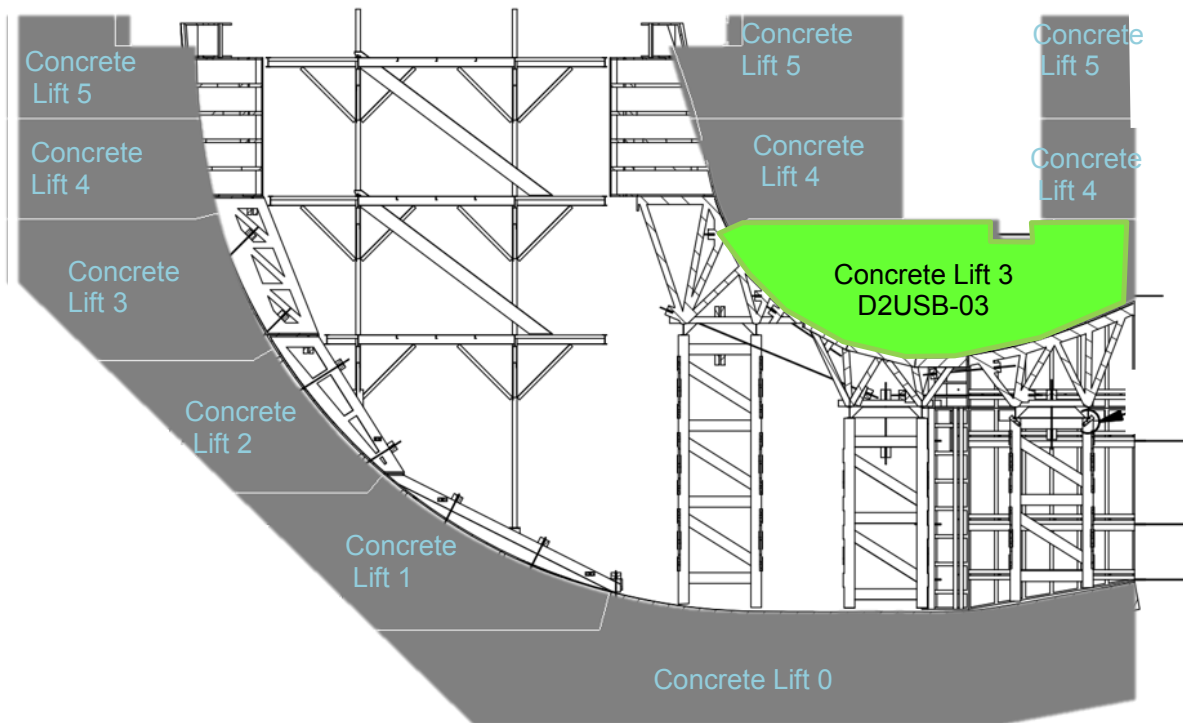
Section A-A from Section 3, Naming convention of concrete lifts in draft tubes.
